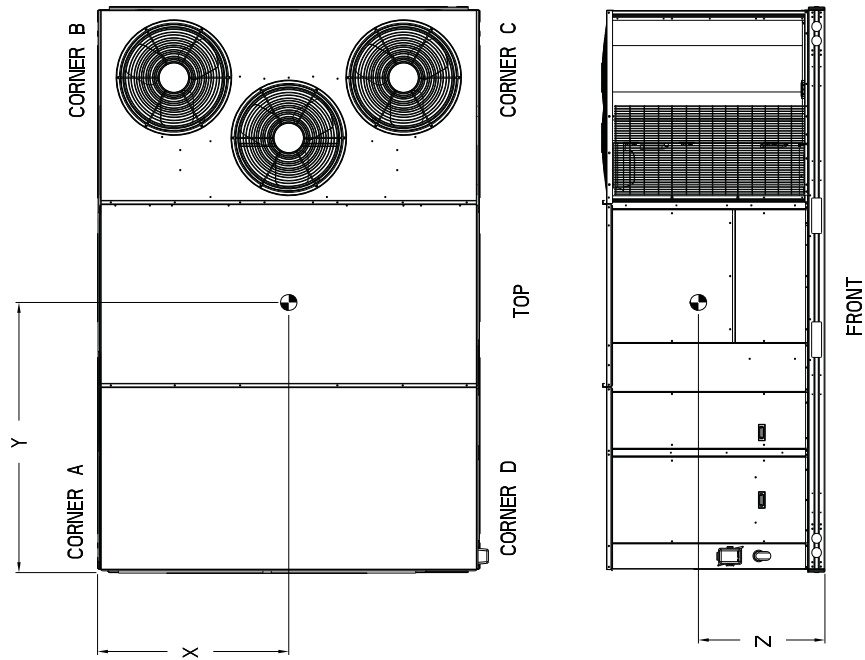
RHS181-183 Unit Dimensional Drawing (cont)
